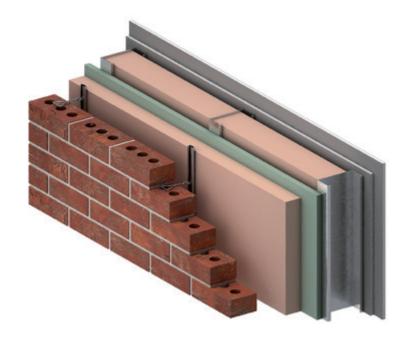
(continued) External wall supporting brickwork without and with sheathing boards
